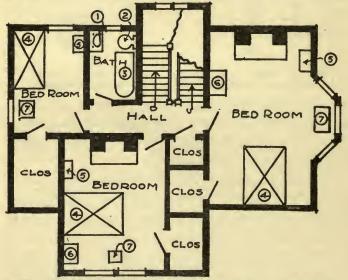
Sketch Plan Showing Arrangement of Furniture.
